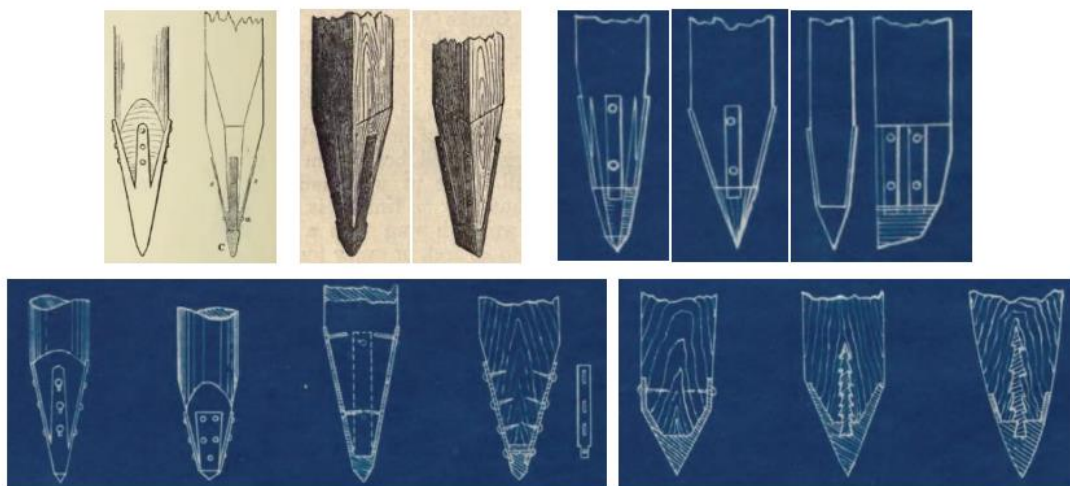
Applications of steel shoe on wooden piles (Notes On Building Construction, 1891, v.2, p.226) - (Dobson, 1872, p.84) - (Derleth, 1921) - (Dabanlı et al., 2013)
